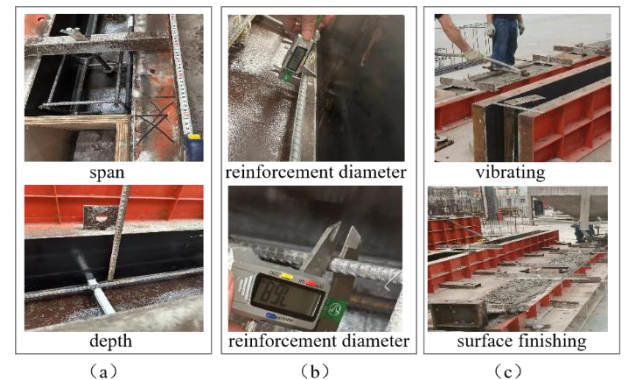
Specimen preparation: (a) formworks; (b) reinforcement arrangement; (c) concrete casting.
